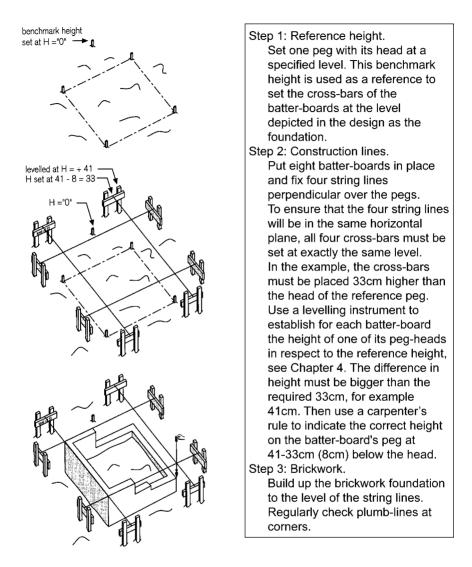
Using batter-boards and string lines to set out and lay a brick foundation.
